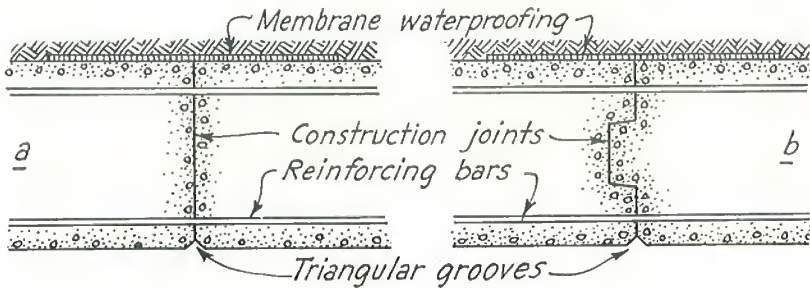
Horizontal sections of a plain and a key-and-groove construction joint used in abutment walls. The reinforcement extends across the joint.
